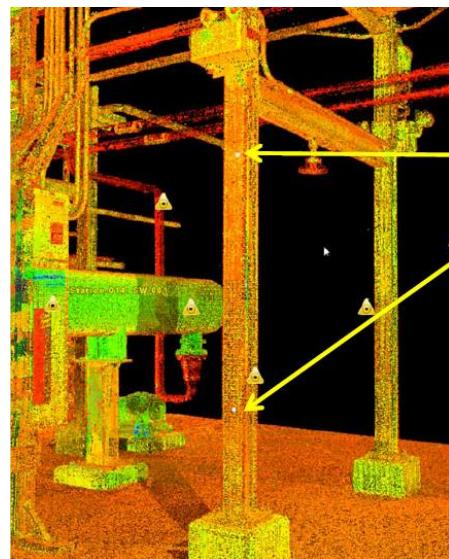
Cyclone 9.0 can model steel beams using the multi-pick method.
